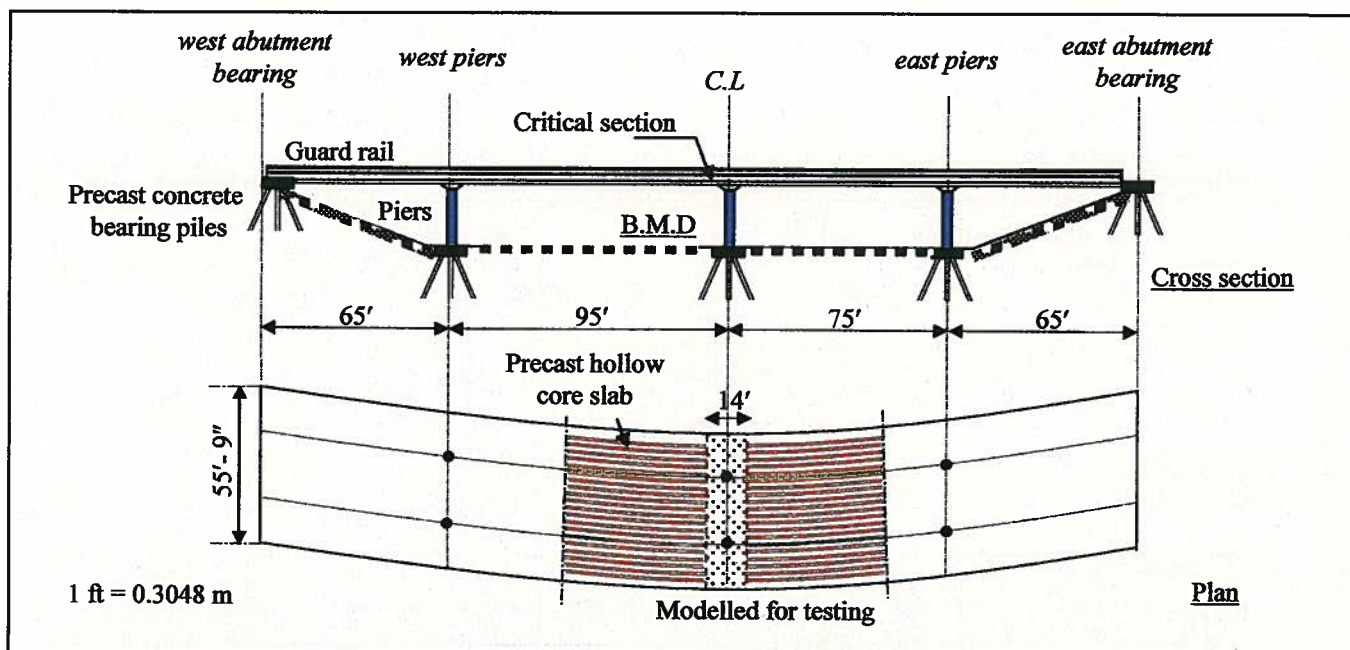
Schematic of Bridge No. 444 in Winnipeg, Manitoba, Canada.
